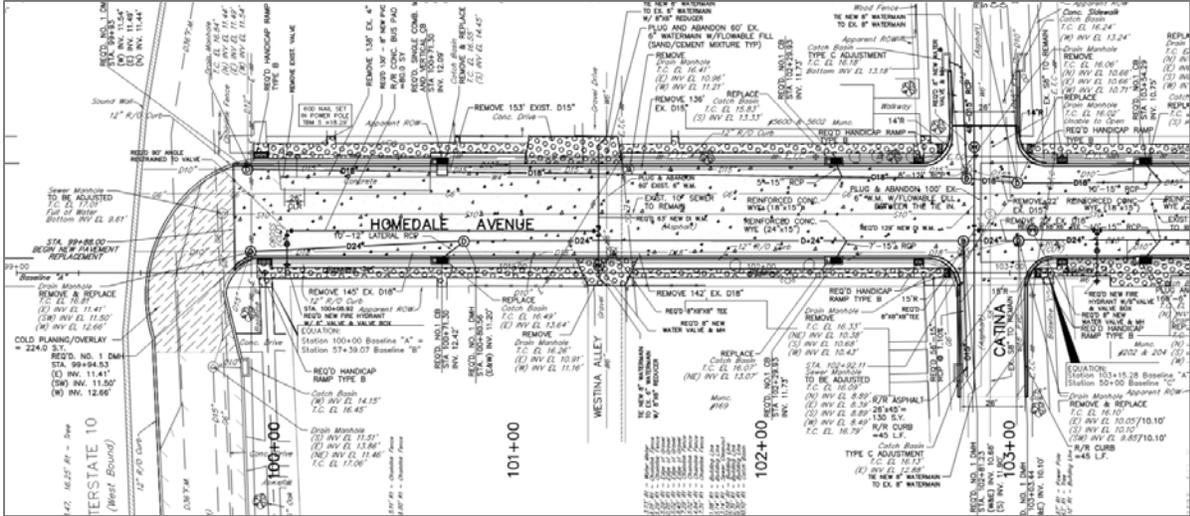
Example of a Plan View Examined to Obtain Pertinent Conduit Details
